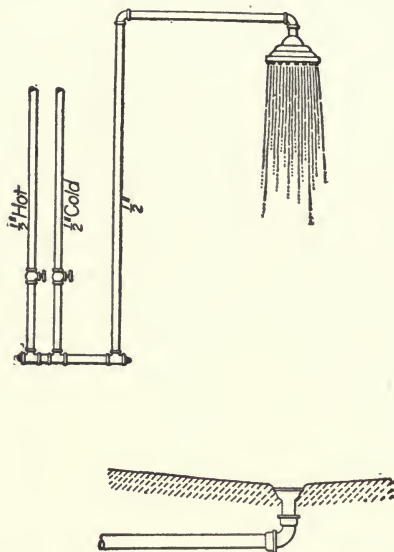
A Simple Shower Mixing Pipe for a Washroom.
